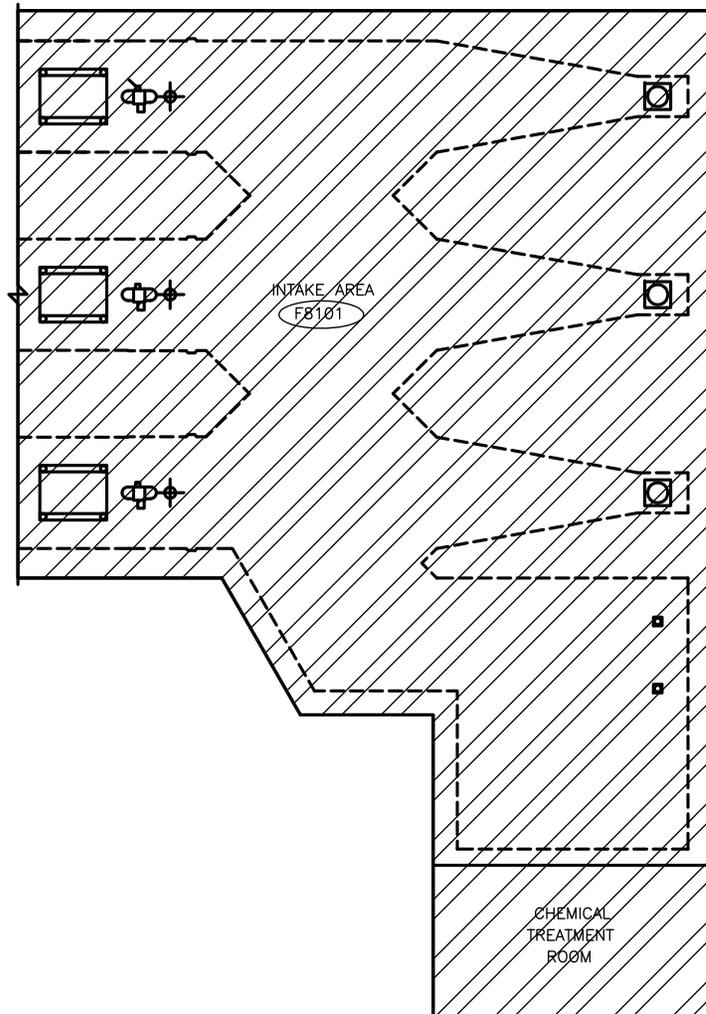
A.2-201 Fire Zones - Station Water Intake Building
